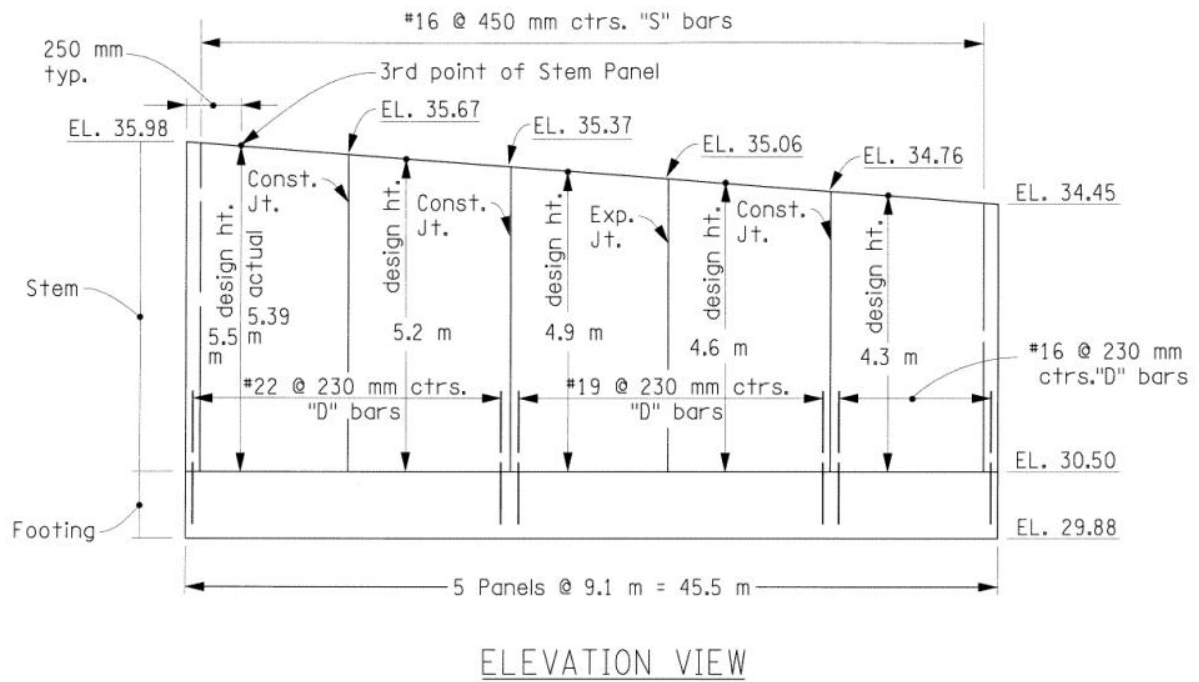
Illustrative Example (Slightly Sloping Wall – Elevation View)
